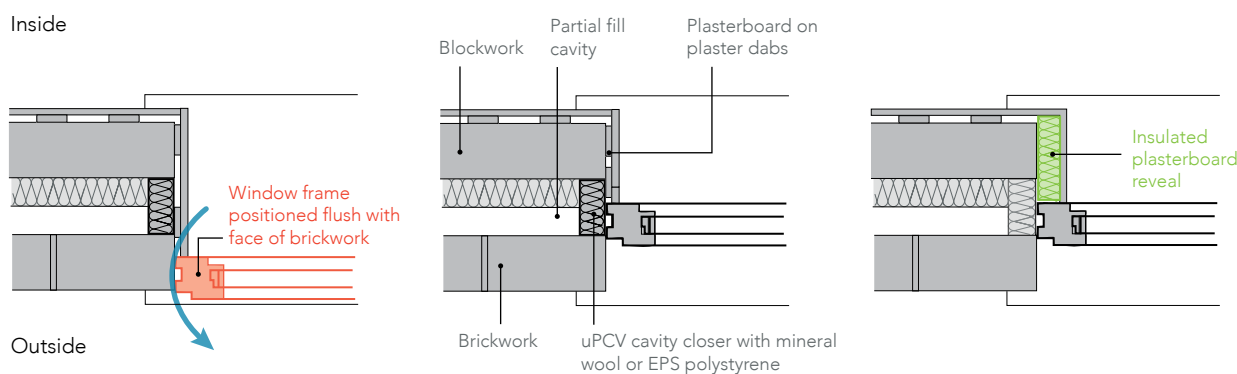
Poor (left), standard (middle) and good (right) detailing for minimising thermal bridges around windows
